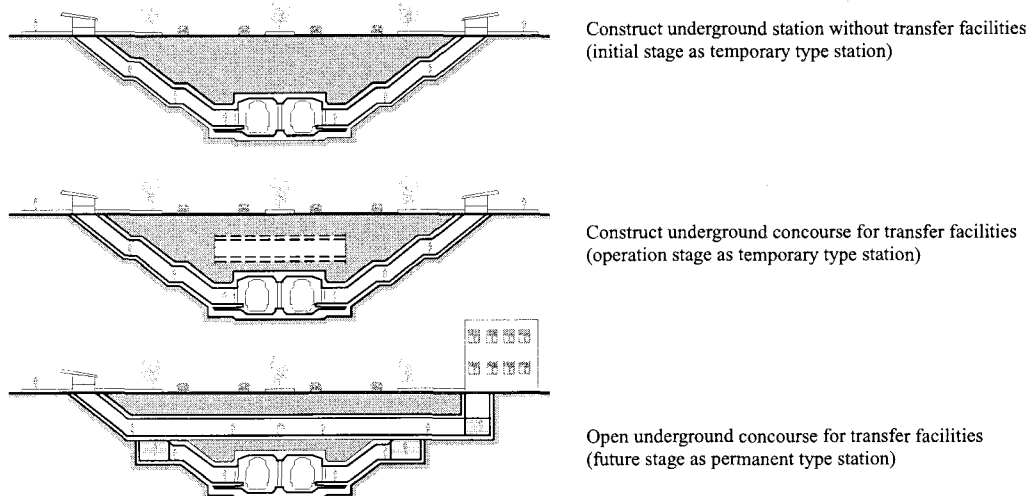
Alternative by Staging Construction of Underground Station as Temporary and Permanent Type
